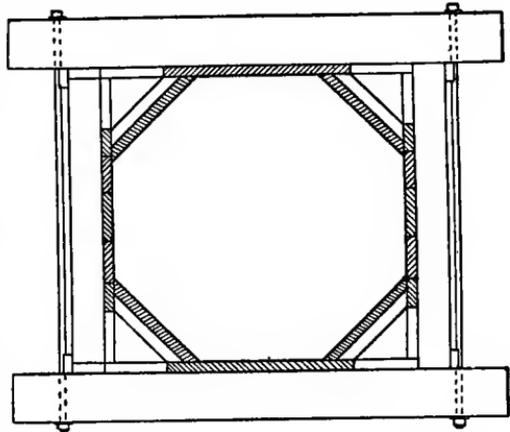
FORM FOR OCTAGONAL COLUMN.
